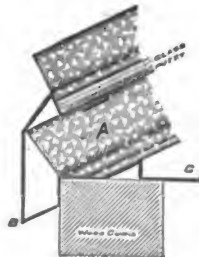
Construction of metal curb over wood curb wider than 2", flange G turned down inside of wood curb and nailed.
